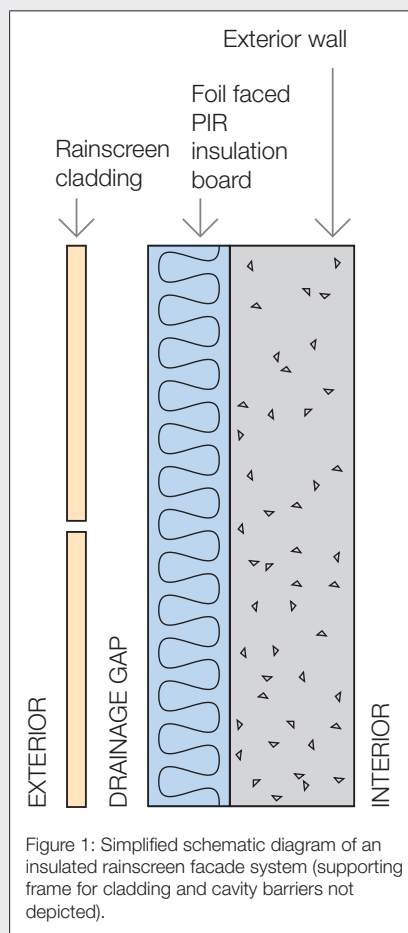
Simplified schematic diagram of an insulated rainscreen facade system (supporting frame for cladding and cavity barriers not depicted).
